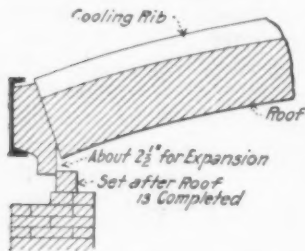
Skewback Construction, Designed to Permit Wall to Expand at Top
